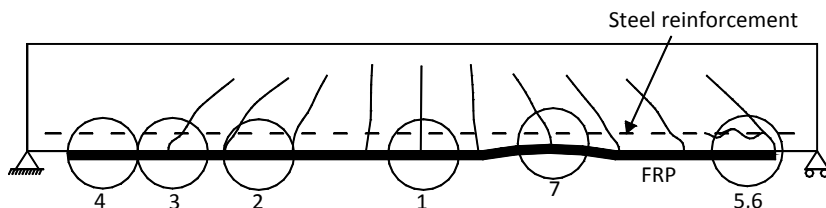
Failure modes of a RC beam with externally bonded FRP (partial from (fib 2001))
